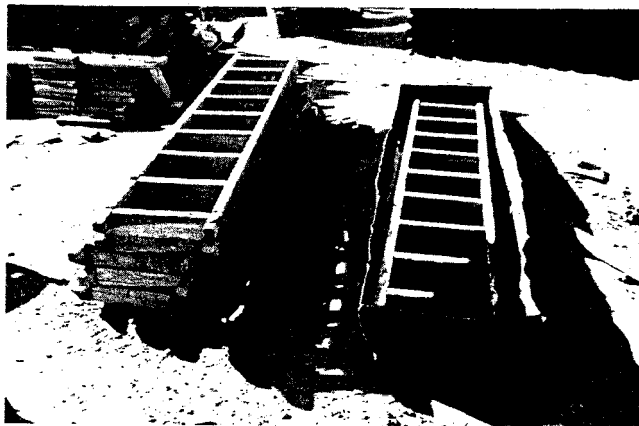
WOODEN MOLDING FORM SOAKING IN OIL TANK; Adobe Enterprises, Inc., Albuquerque.
